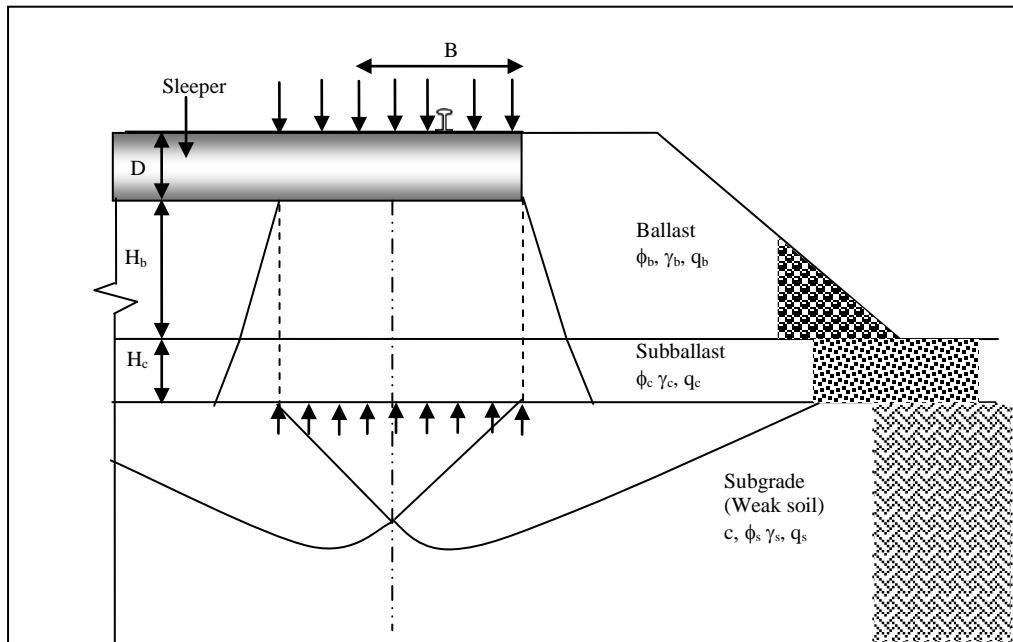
Failure of track substructure below sleeper on ballast, subballast(capping) layers overlying weak subgrade
